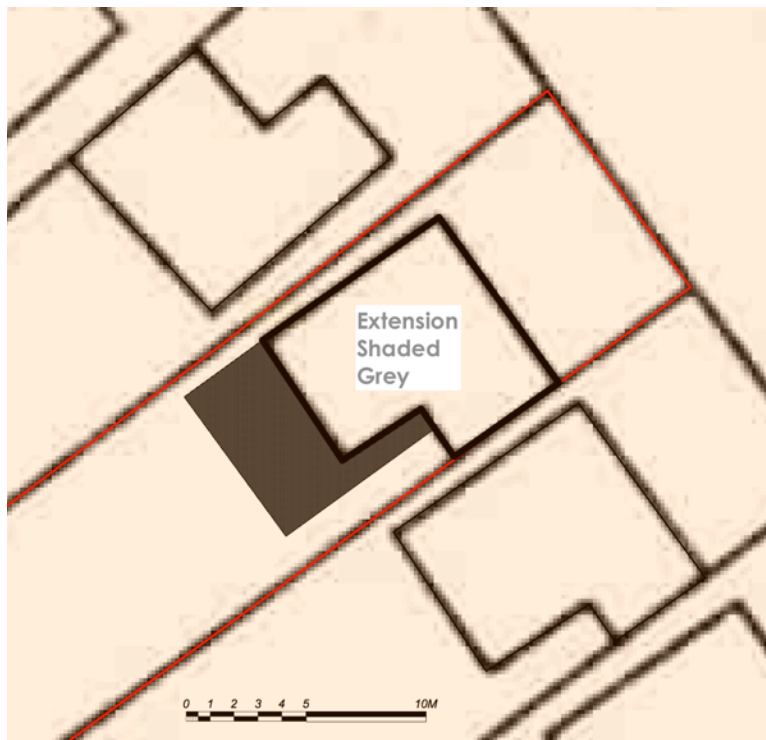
Block Plan Showing Proposed Rear / Side Extension, Scale 1:200
